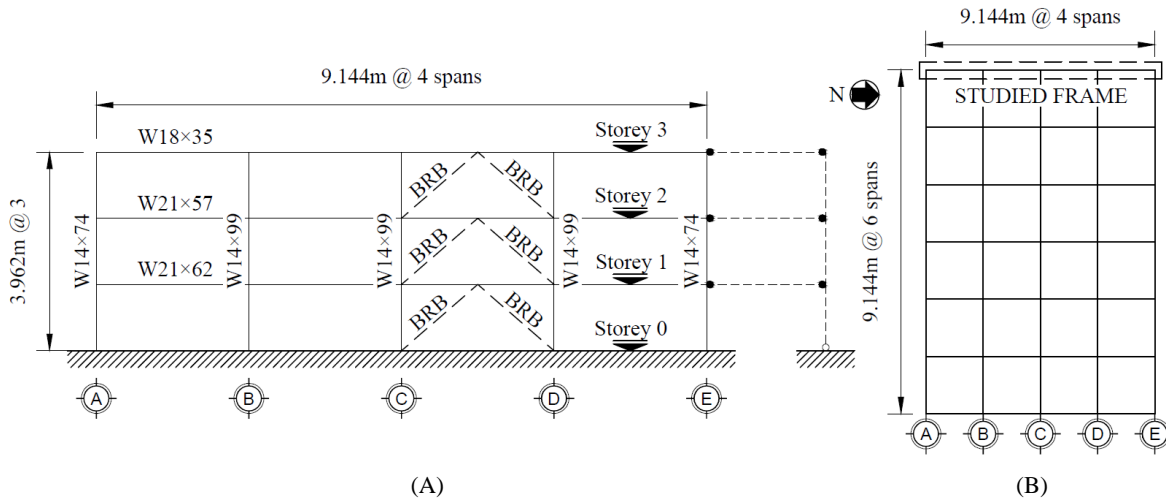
Case study structure: (A) elevation view, (B) plan view. [Adapted from Gutiérrez-Urzúa and Freddi [20]].
